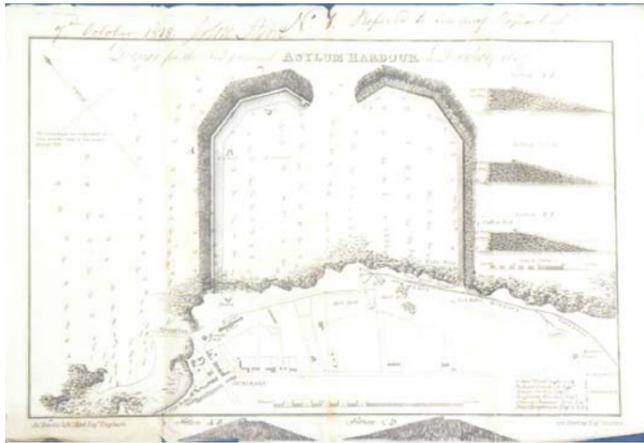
(above): Drawing of Rennie's original plan for the harbour with smaller opening than constructed.
